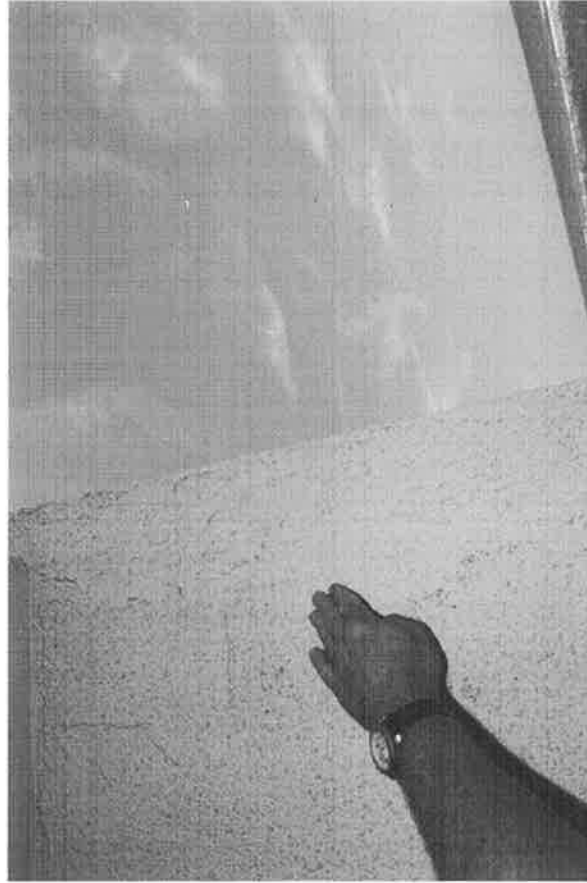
Area of previously repaired crack in CMU wall (typical)
